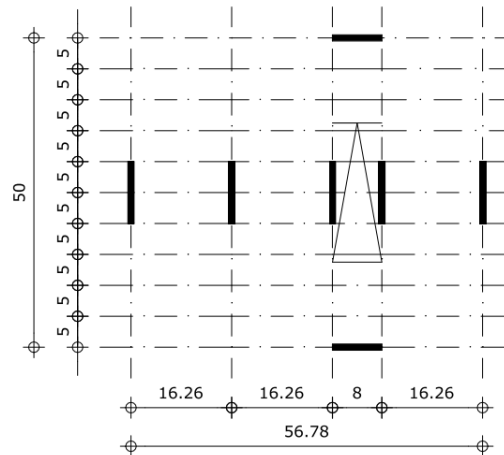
Car park floor plan with bold lines indicating the vertical stability system in m
